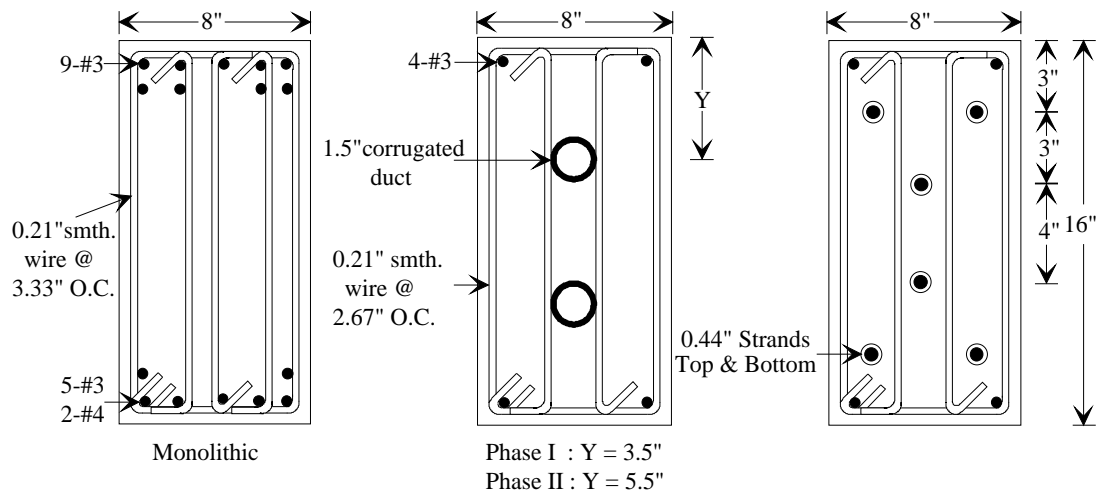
Beam Cross-Sections for Connections Tested at NIST
